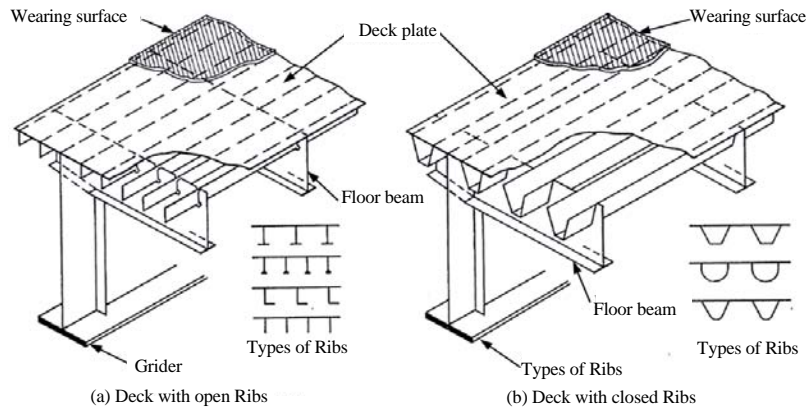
Typical orthotropic steel deck bridge configuration AISC
